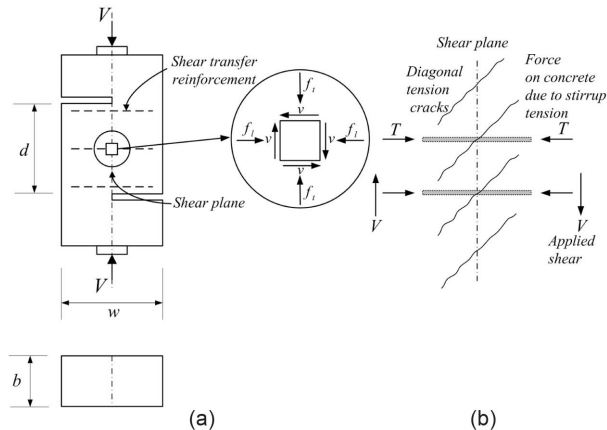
Bi-axial stresses and truss action (a) Typical shear transfer test specimen (b) "Truss" formed after diagonal tension cracking
